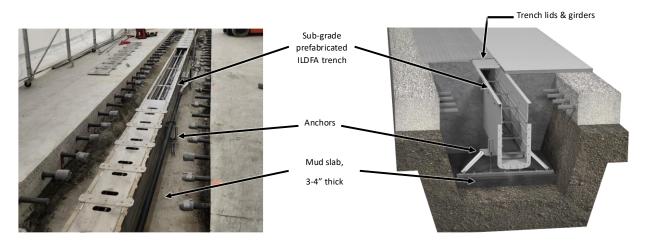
ILDFA prefabricated trench for retrofit projects
